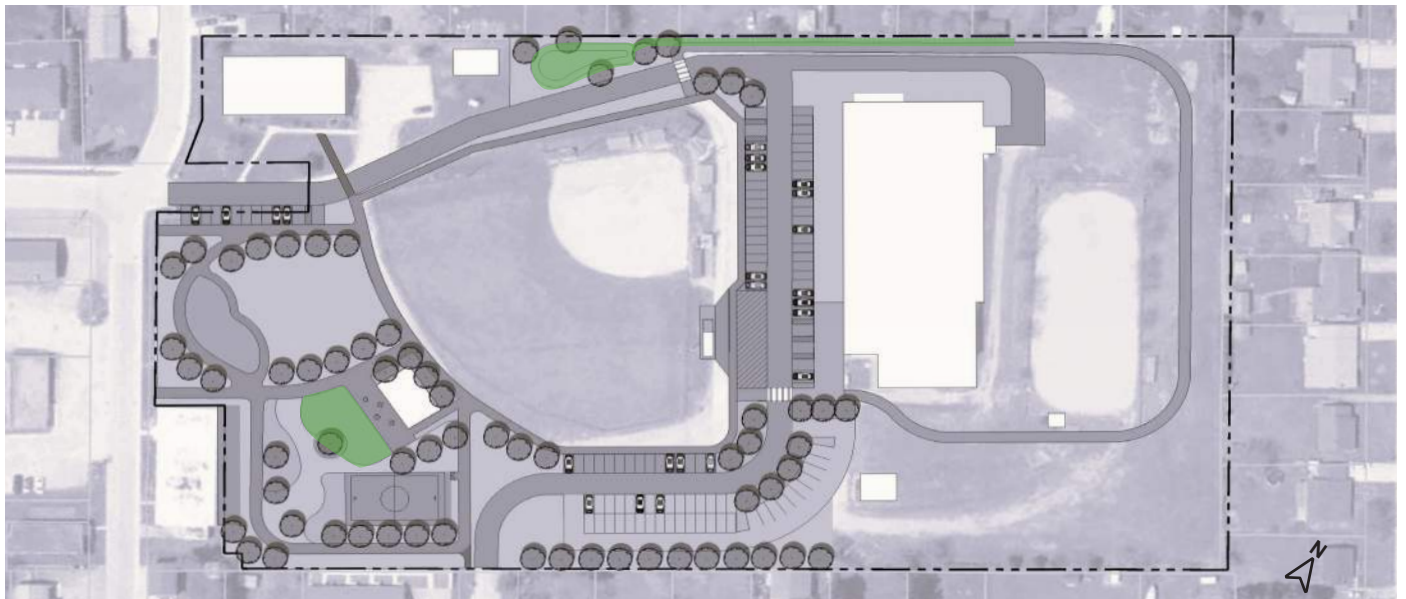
Master Plan Concept Design for Play Area, Rain Garden and Pedestrian Path Connection
